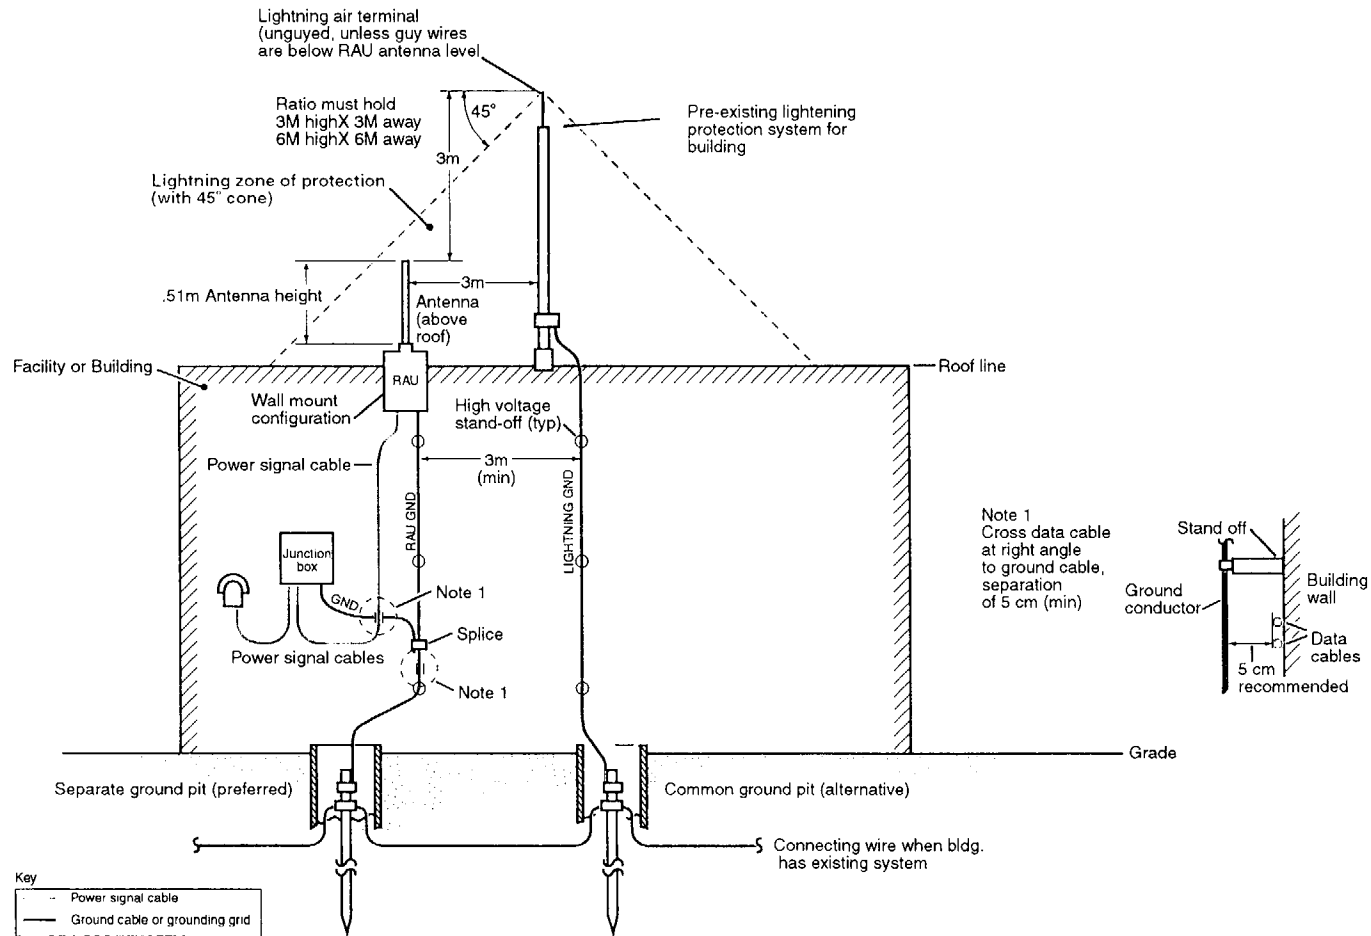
Recommended grounding when building is protected by a pre-existing lightning protection system
